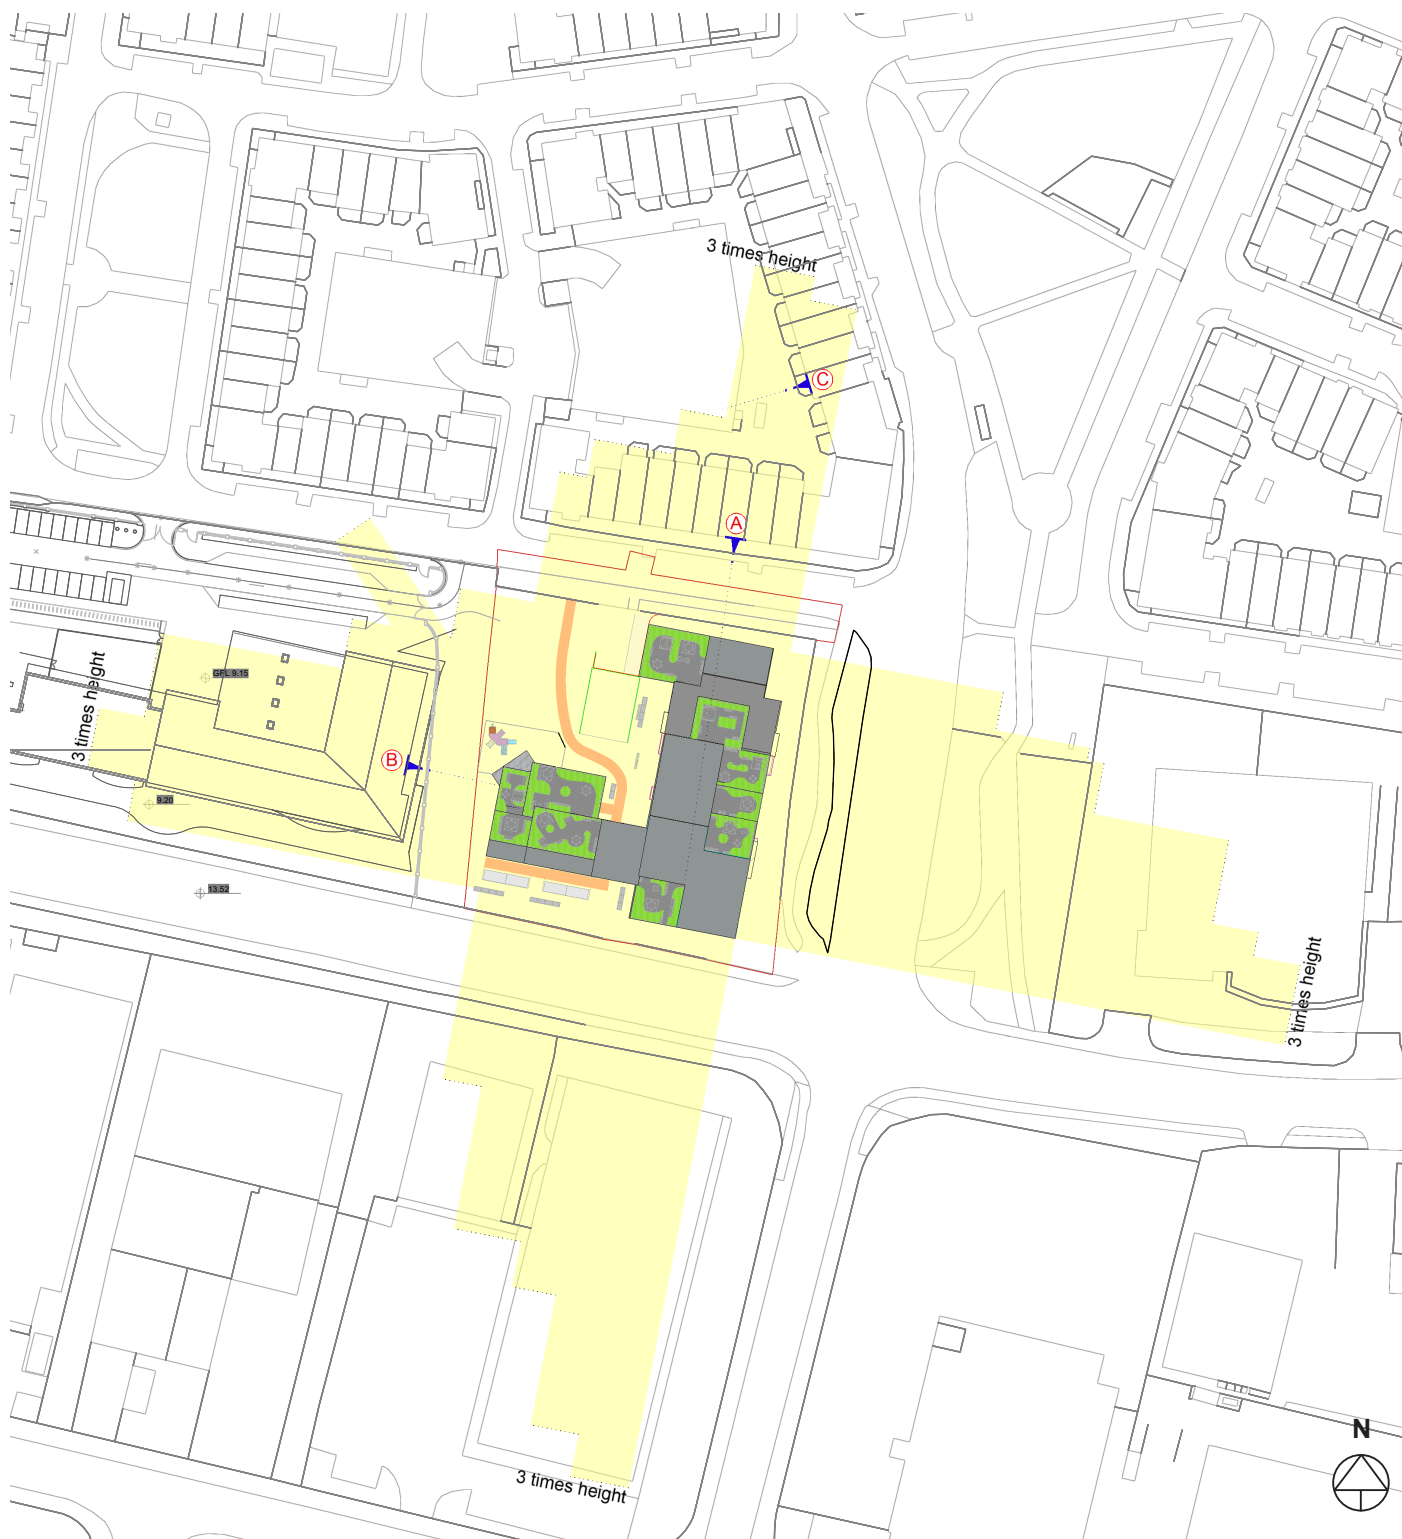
Proposed site plan showing the zone of influence (3 times the height of the proposed building) and direction of the window wall of adjacent residential properties.
